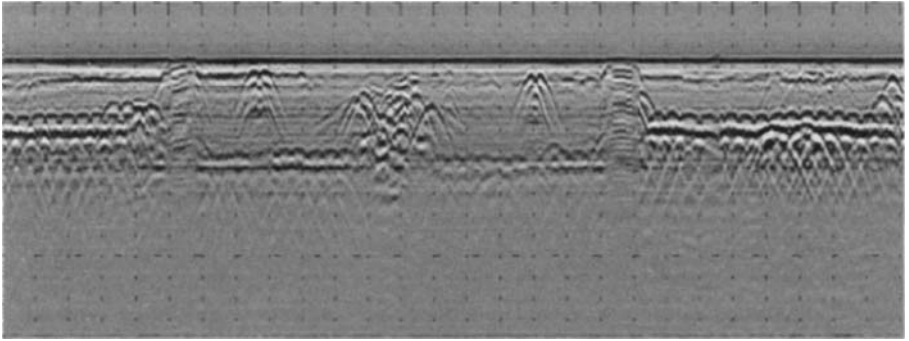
Typical radar image of concrete floor showing rebars, joints, rods etc. (courtesy ERA Technology)
